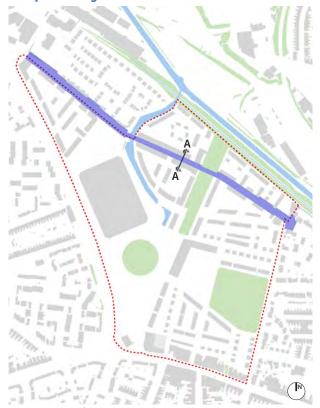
Cranford Street as existing, overlaid on masterplan.
